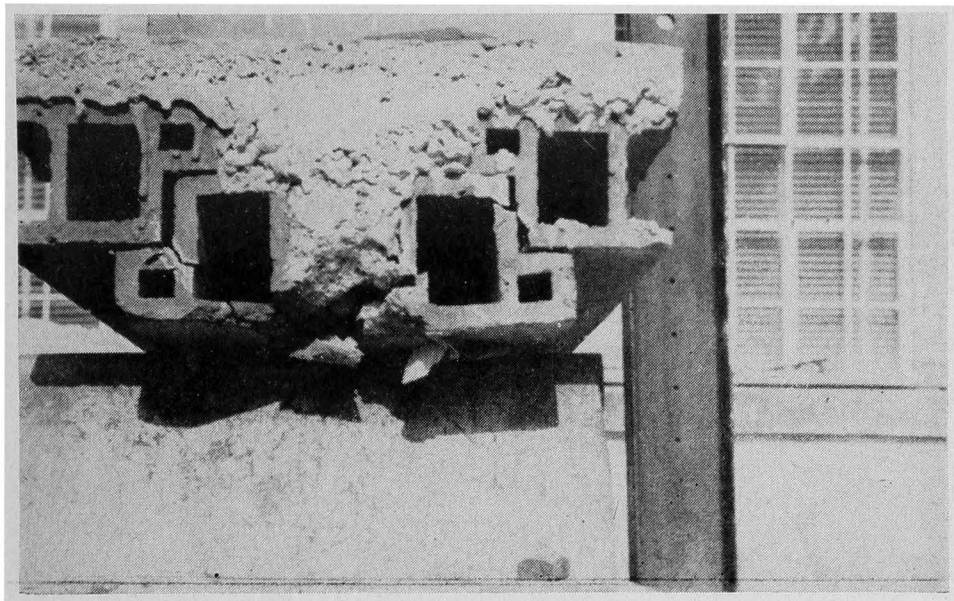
(a). Typical end failure of heavy type beams from Tile B.
